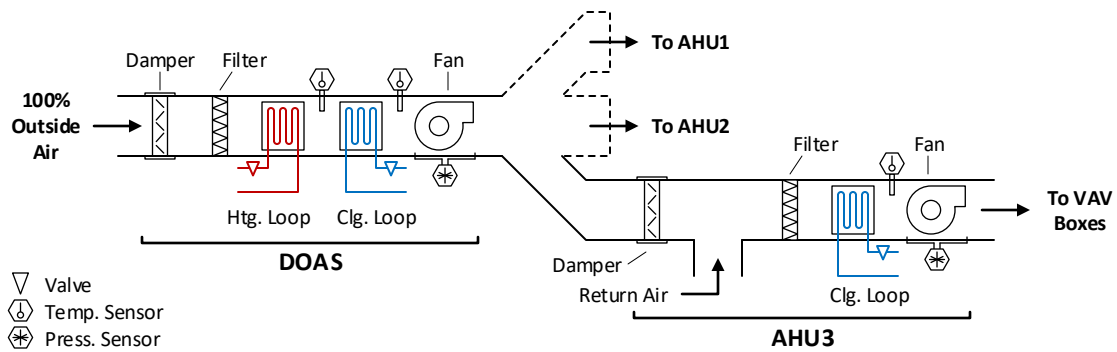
The Gilchrist Building uses a dedicated outdoor air unit for ventilation air.
